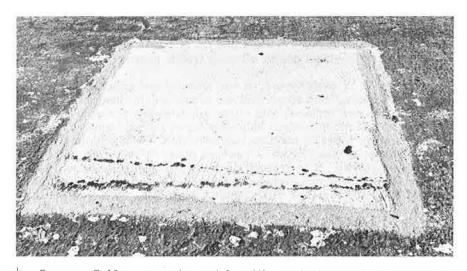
Bayonne Bridge, concrete patch with perimeter seal of sanded polysulfide adhesive.
